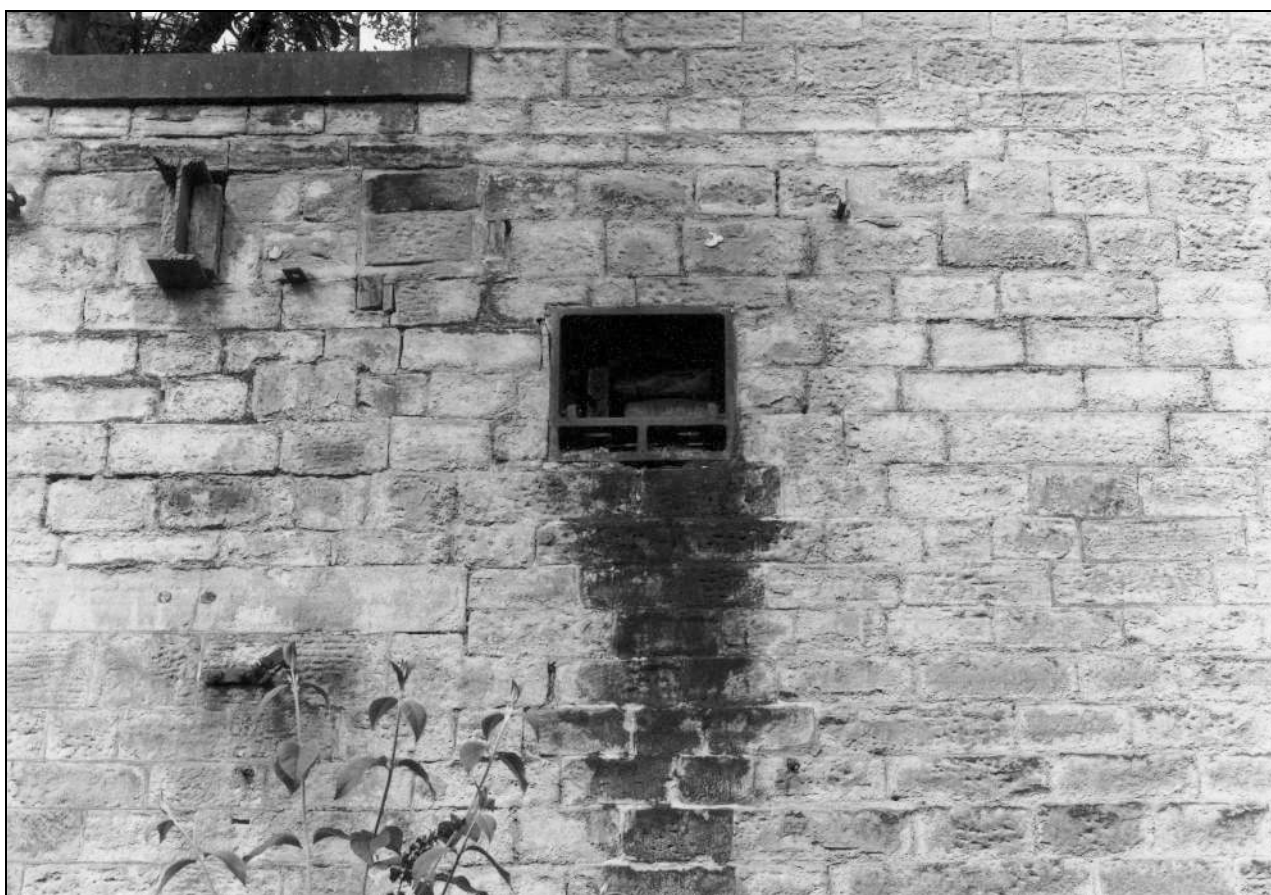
Spinning mill: wall bearing in east gable (film 2, frame 7)
